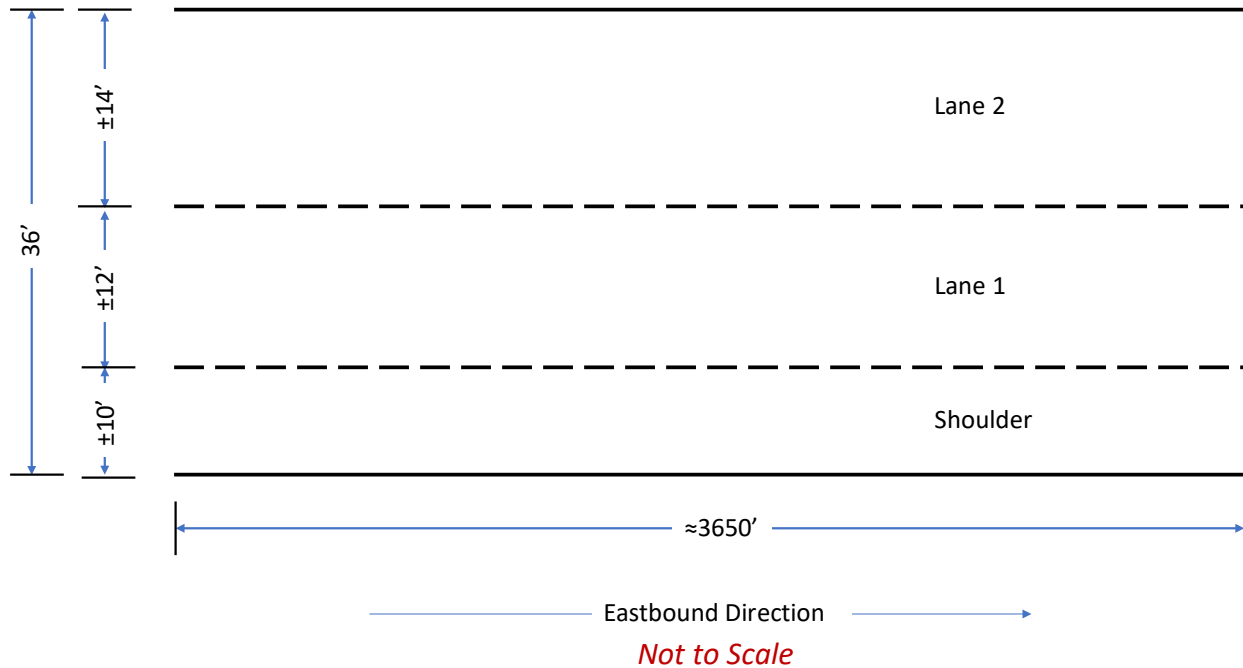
Test Section Pavement Lane Layout and Approximate Dimensions
